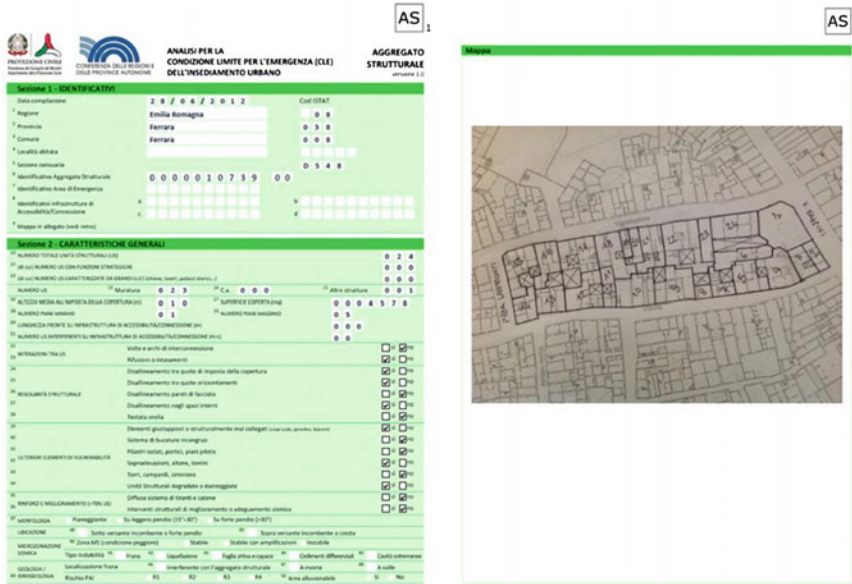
Example of building block from of a structural block in the historic centre of Ferrara
